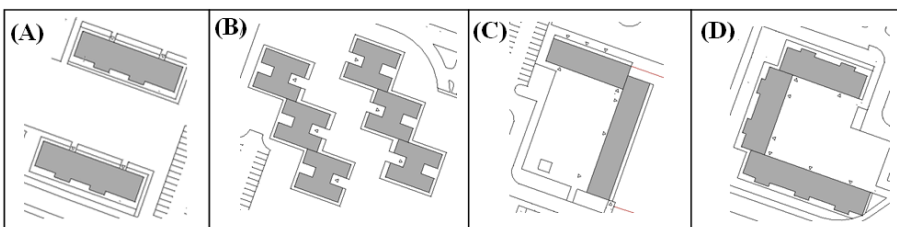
Arrangement Typology in The Mass Housing of 1000 Collective Housing Units, (A): Linear I-Shaped Blocks, (B): Blocks in Degraded Linear Shape Formed by The Assembly Of H-Typed Units, (C) L-Shaped Blocks, (D) U-Shaped Blocks.
